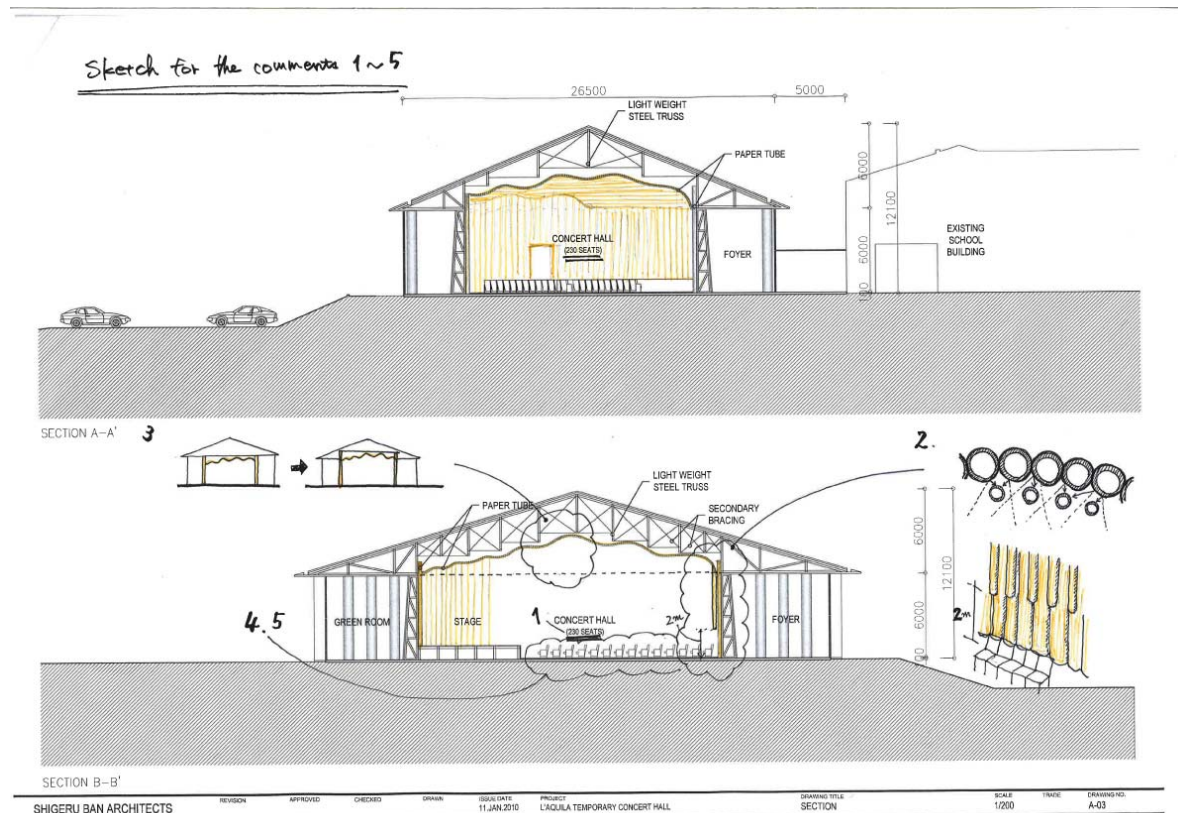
Transverse and longitudinal sections of L'Aquila concert hall
